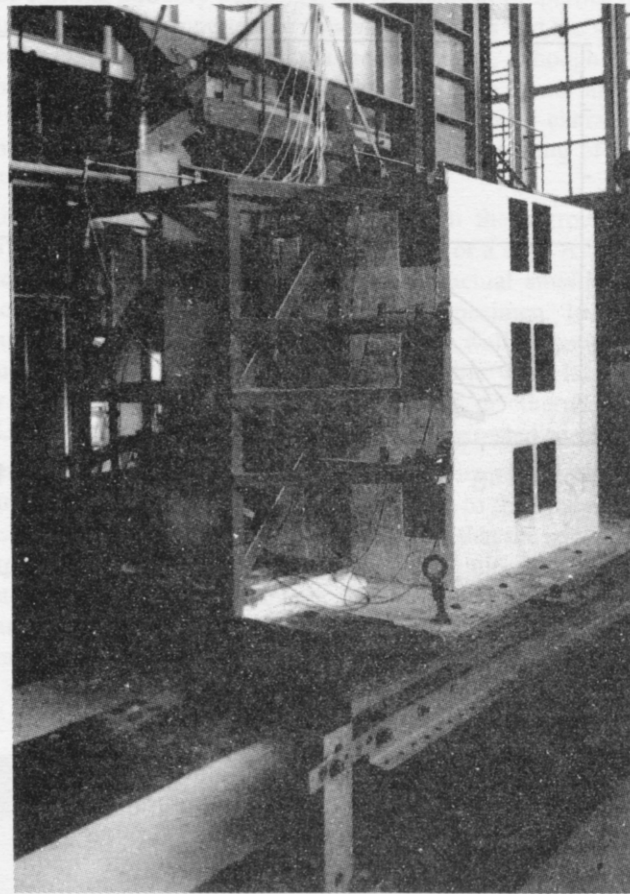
Shaking-table test of a confined masonry building model at ZAG
